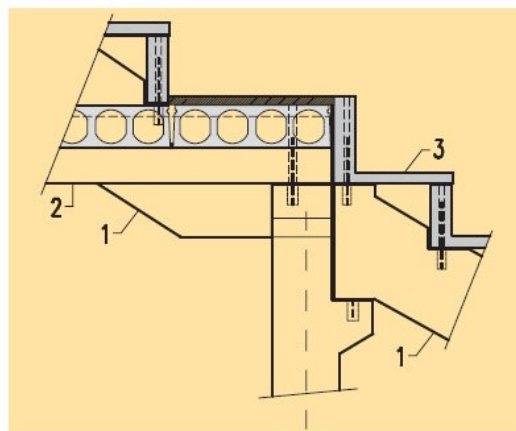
Stand beam (1) impacted between the ribs of ceiling twin beam (2) with bench parts (3) and hollow core slabs (4)
